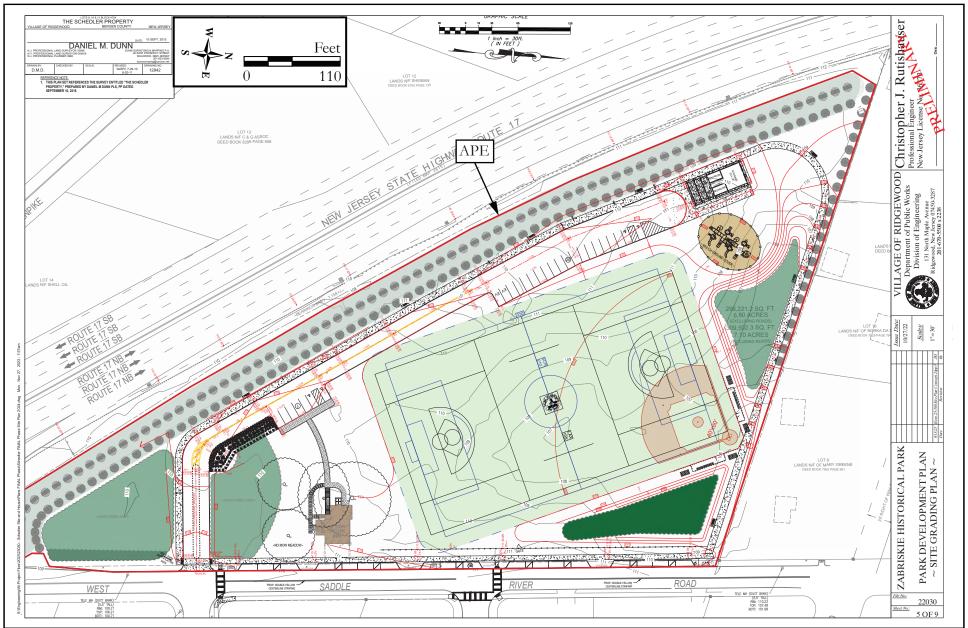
Site Grading Plan, Zabriskie Historical Park (Village of Ridgewood, Department of Public Works 2023b).
